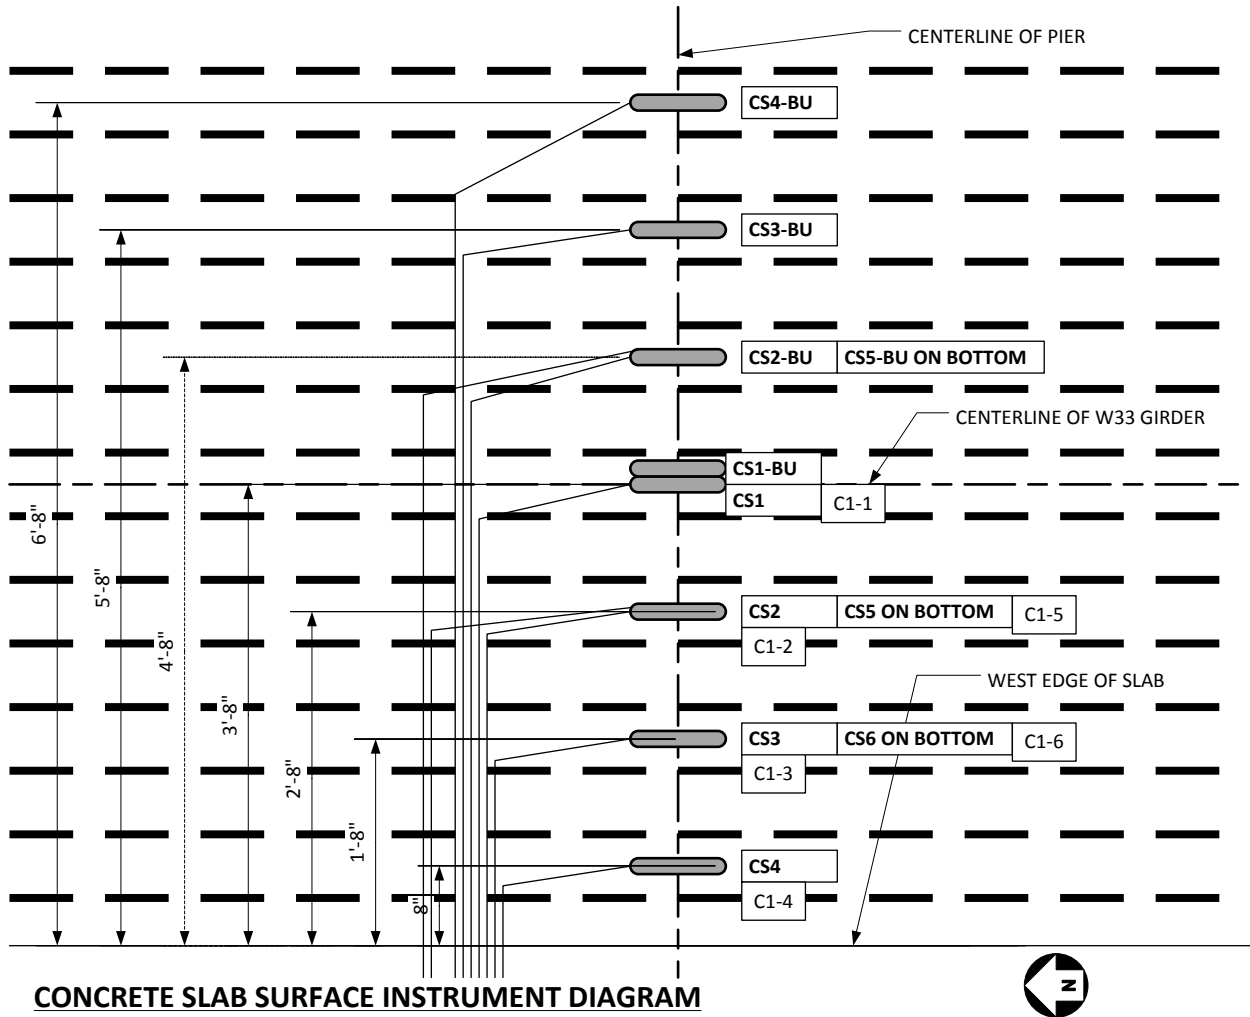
Instrumentation Layout on the Top and Bottom of Slab
